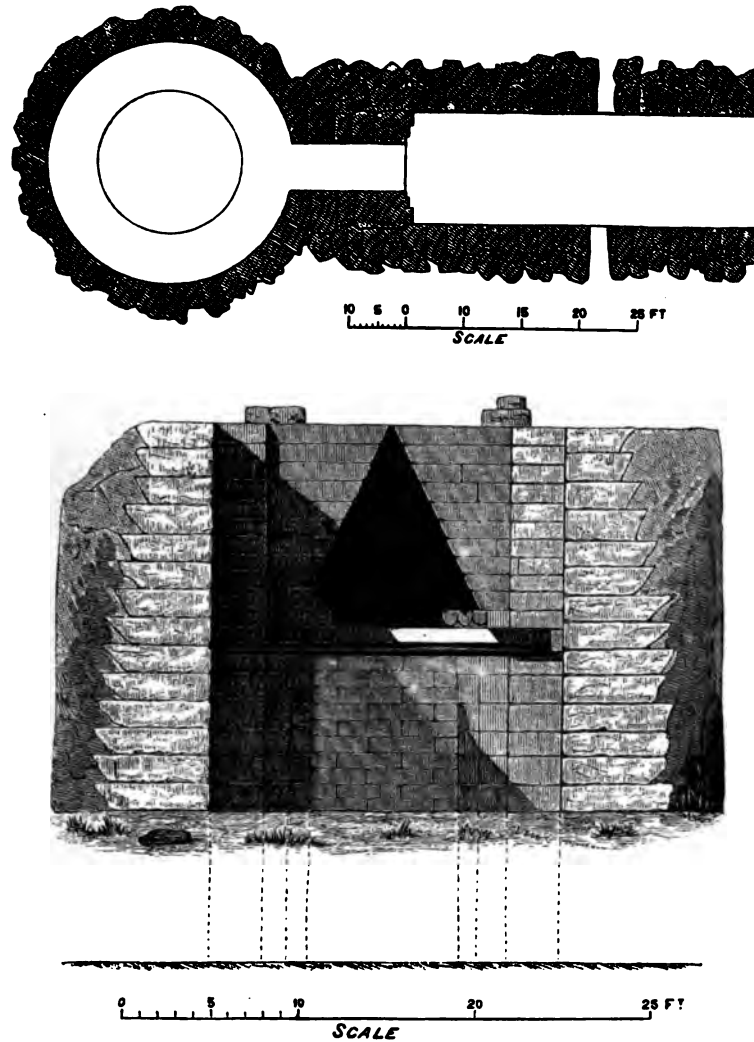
PLAN AND FAÇADE OF TREASURY¹.
